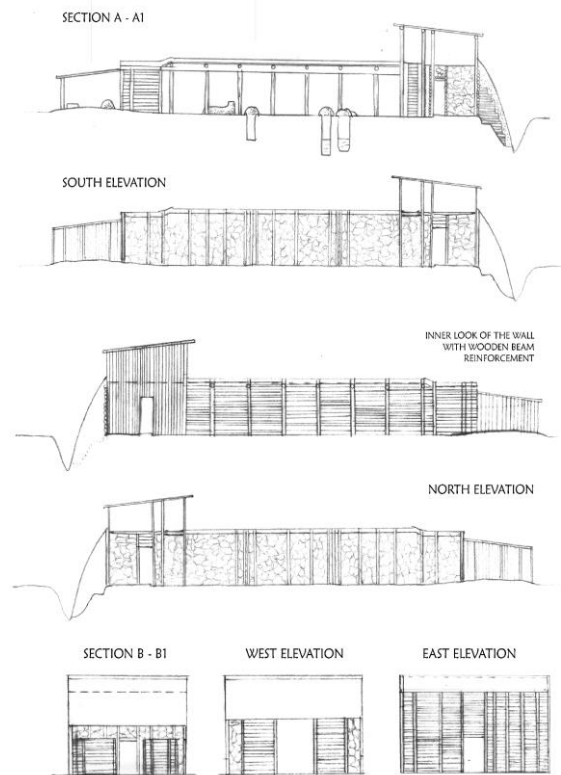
Elevations and Sections on Arkaim dwelling (Developed by Author).
